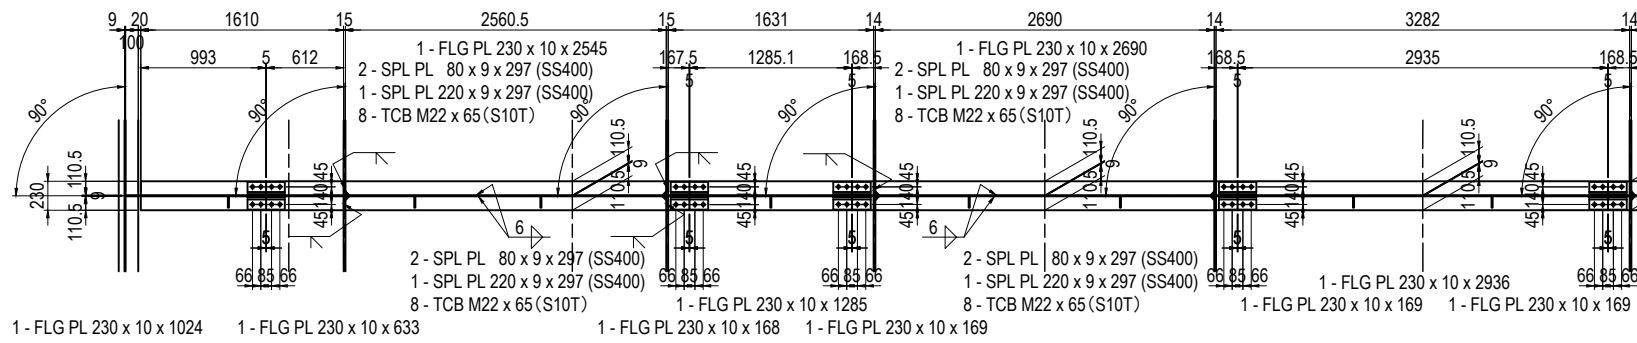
DETAIL OF CROSS BEAM SECTION (1) S=1:60
